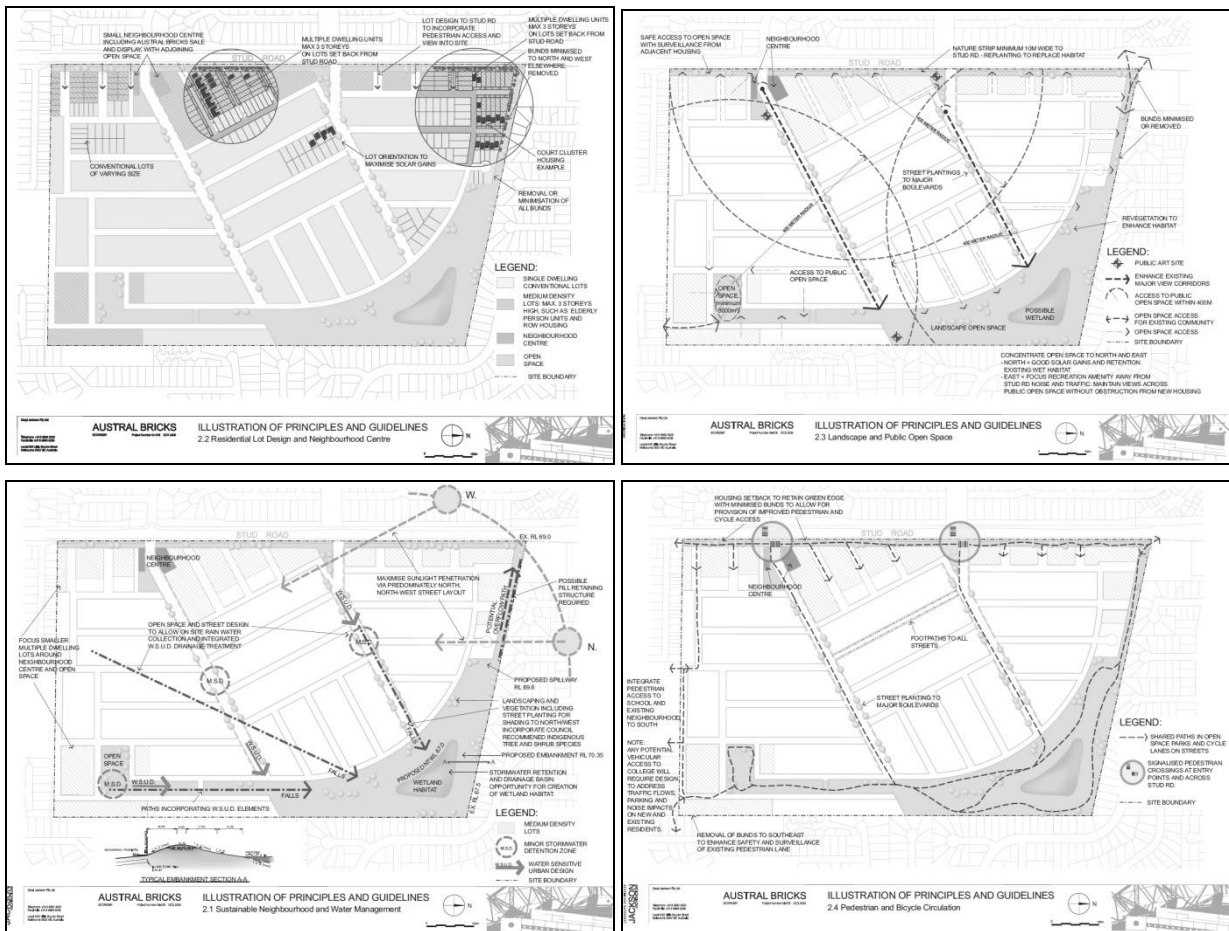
Austral Bricks Scoresby master plan and urban design principles
